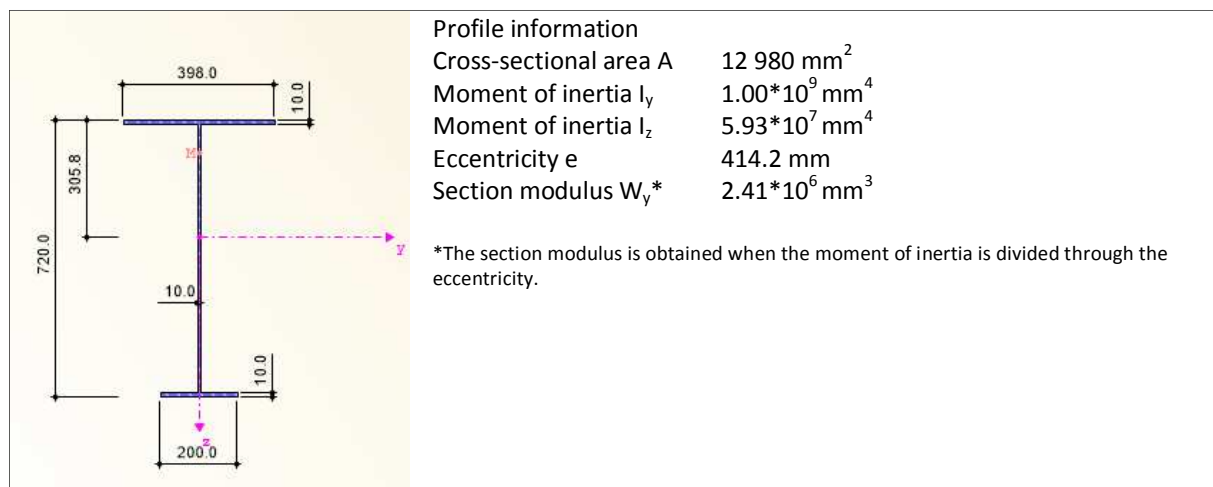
Welded steel section transverse girder, steel grade S235 and dimensions in mm
